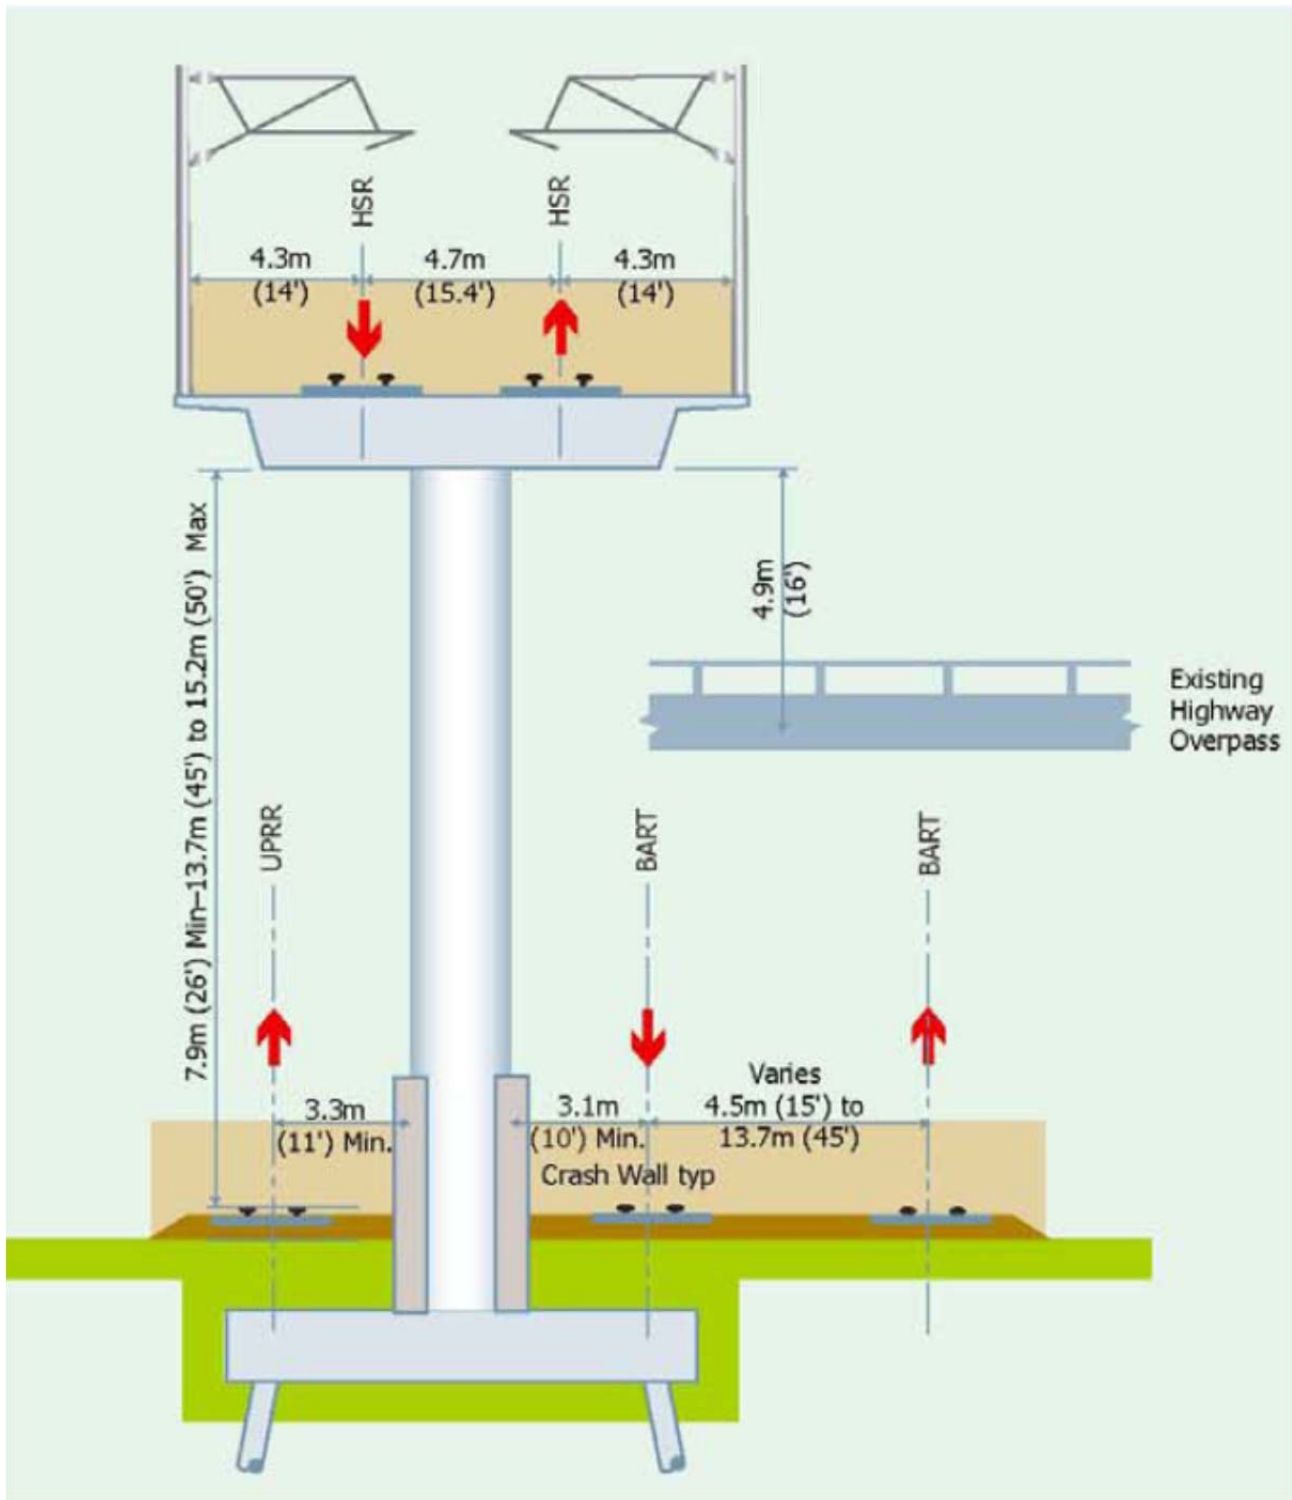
California to Nevada Elevated HSR above Highway Overpass and Rail Cross Section
